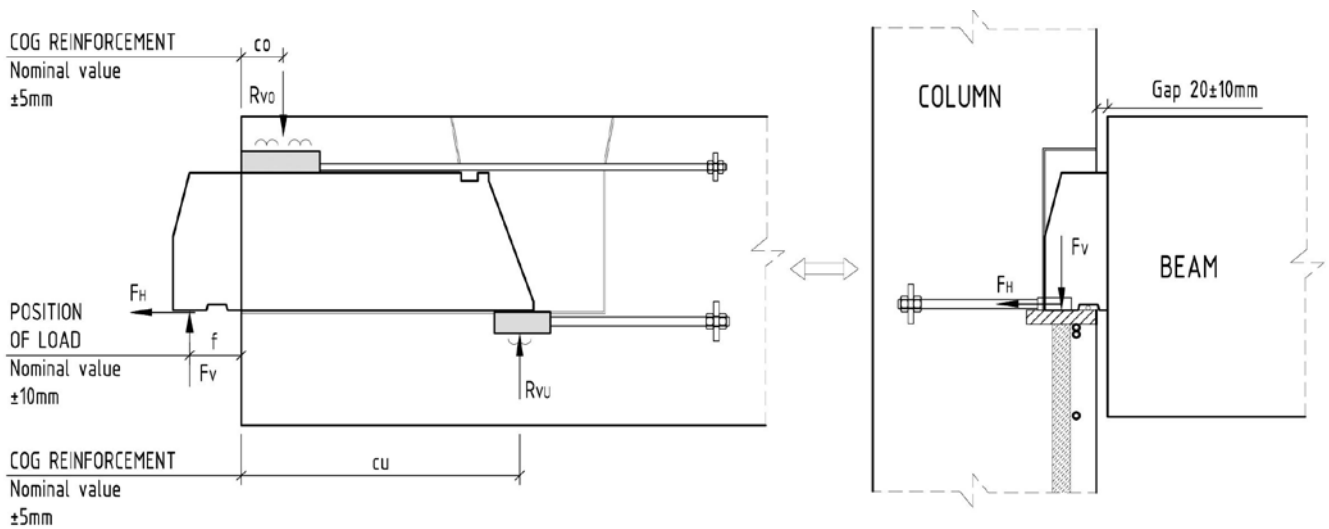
Tolerances on anchoring stirrups and gap.
